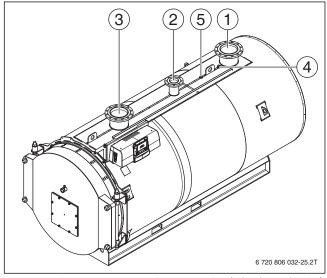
Boiler Uni 3000 F 120 kW to 820 kW (left = rear of boiler)
